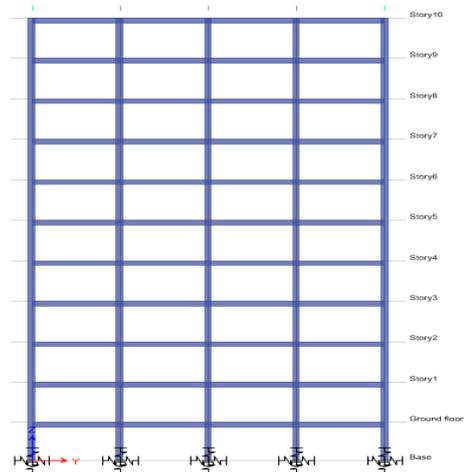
Elevation of Bare Frame Model with Flexible Base
